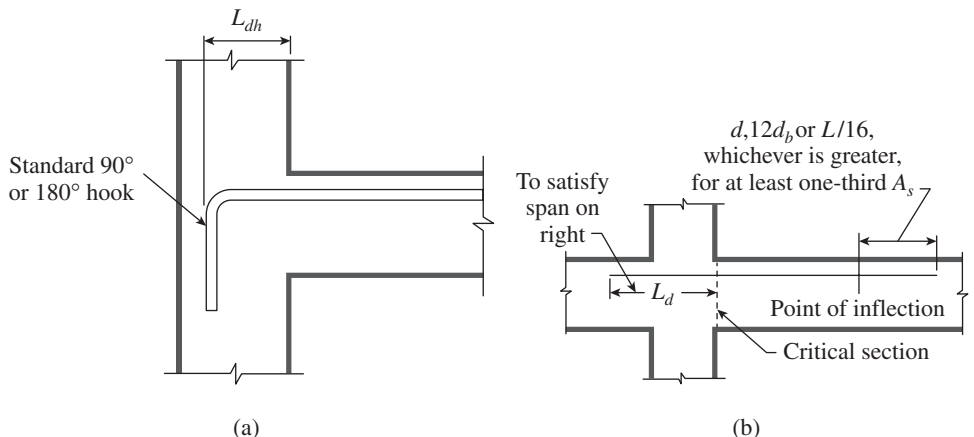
Development of negative moment reinforcement (a) Anchorage into exterior column (b) Anchorage into adjacent beam
